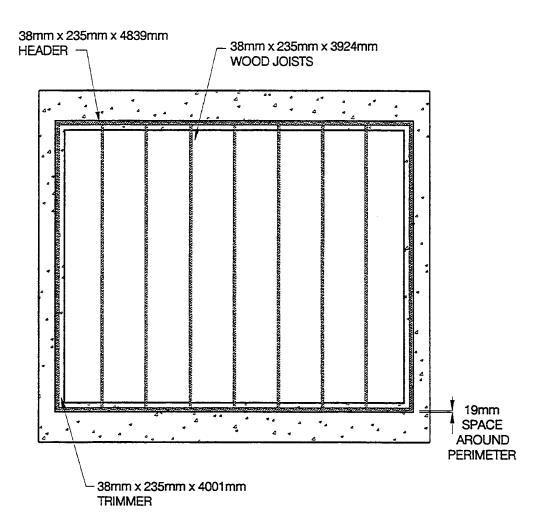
Layout for joists 610 mm o.c with joist on mid-line of the floor opening (9 joists).
